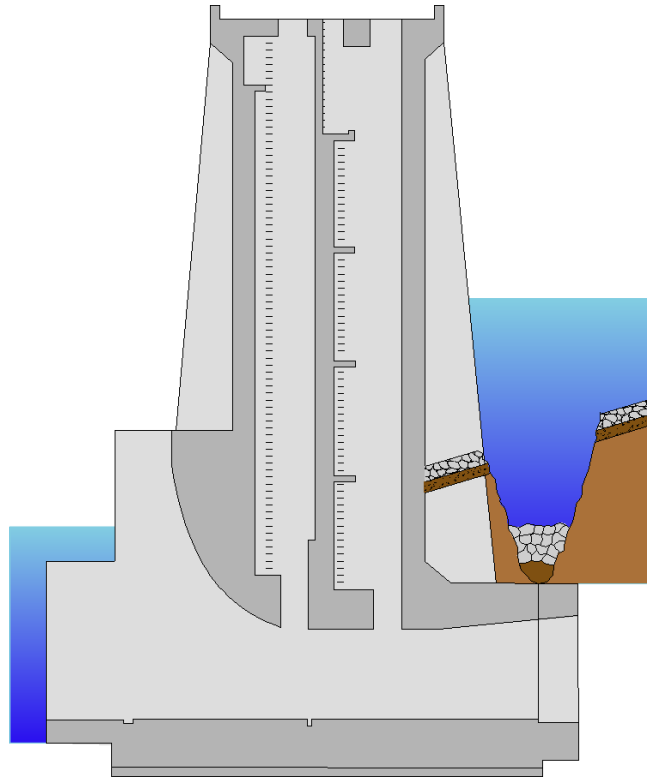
A sinkhole occurred above the monolith joint at the junction of the intake tower and the upstream end of the transition section.
